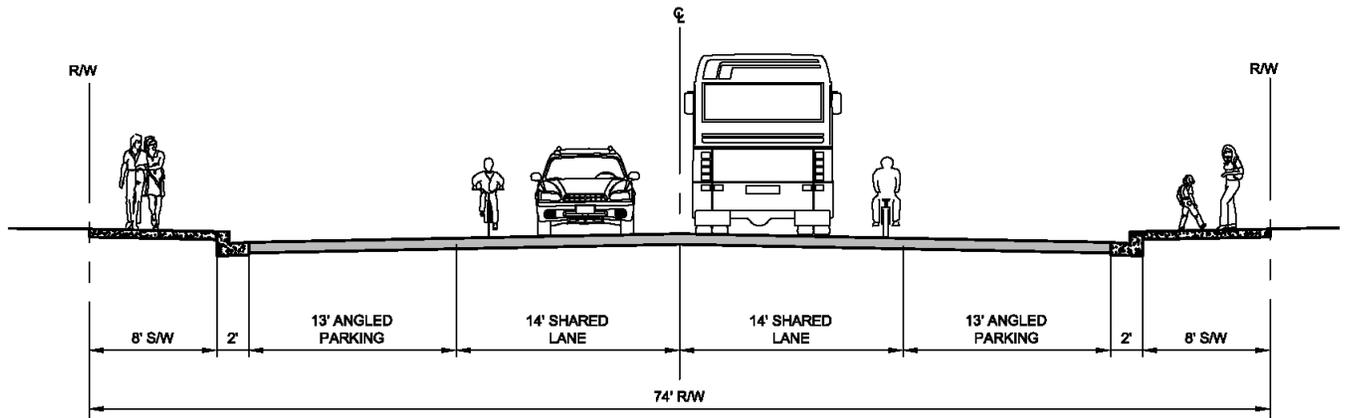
West Army (between Market Street and Panama Street) Street Typical Section
